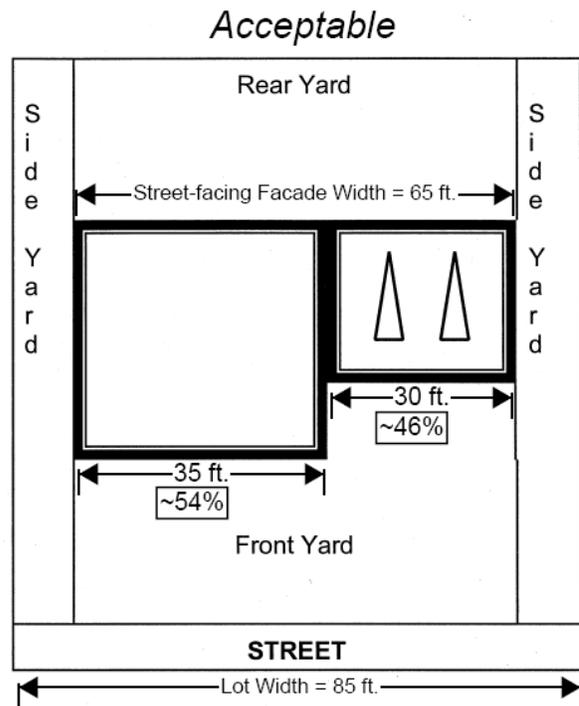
B - Acceptable Width of Street-facing Garage on a Lot $>$ 50 ft. Wide
